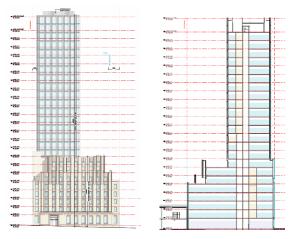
South elevation (Londsdale Street, L), and north-south section looking west (R)
